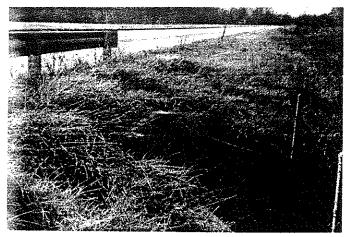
Short section of guardrail at hazardous culvert headwall.
